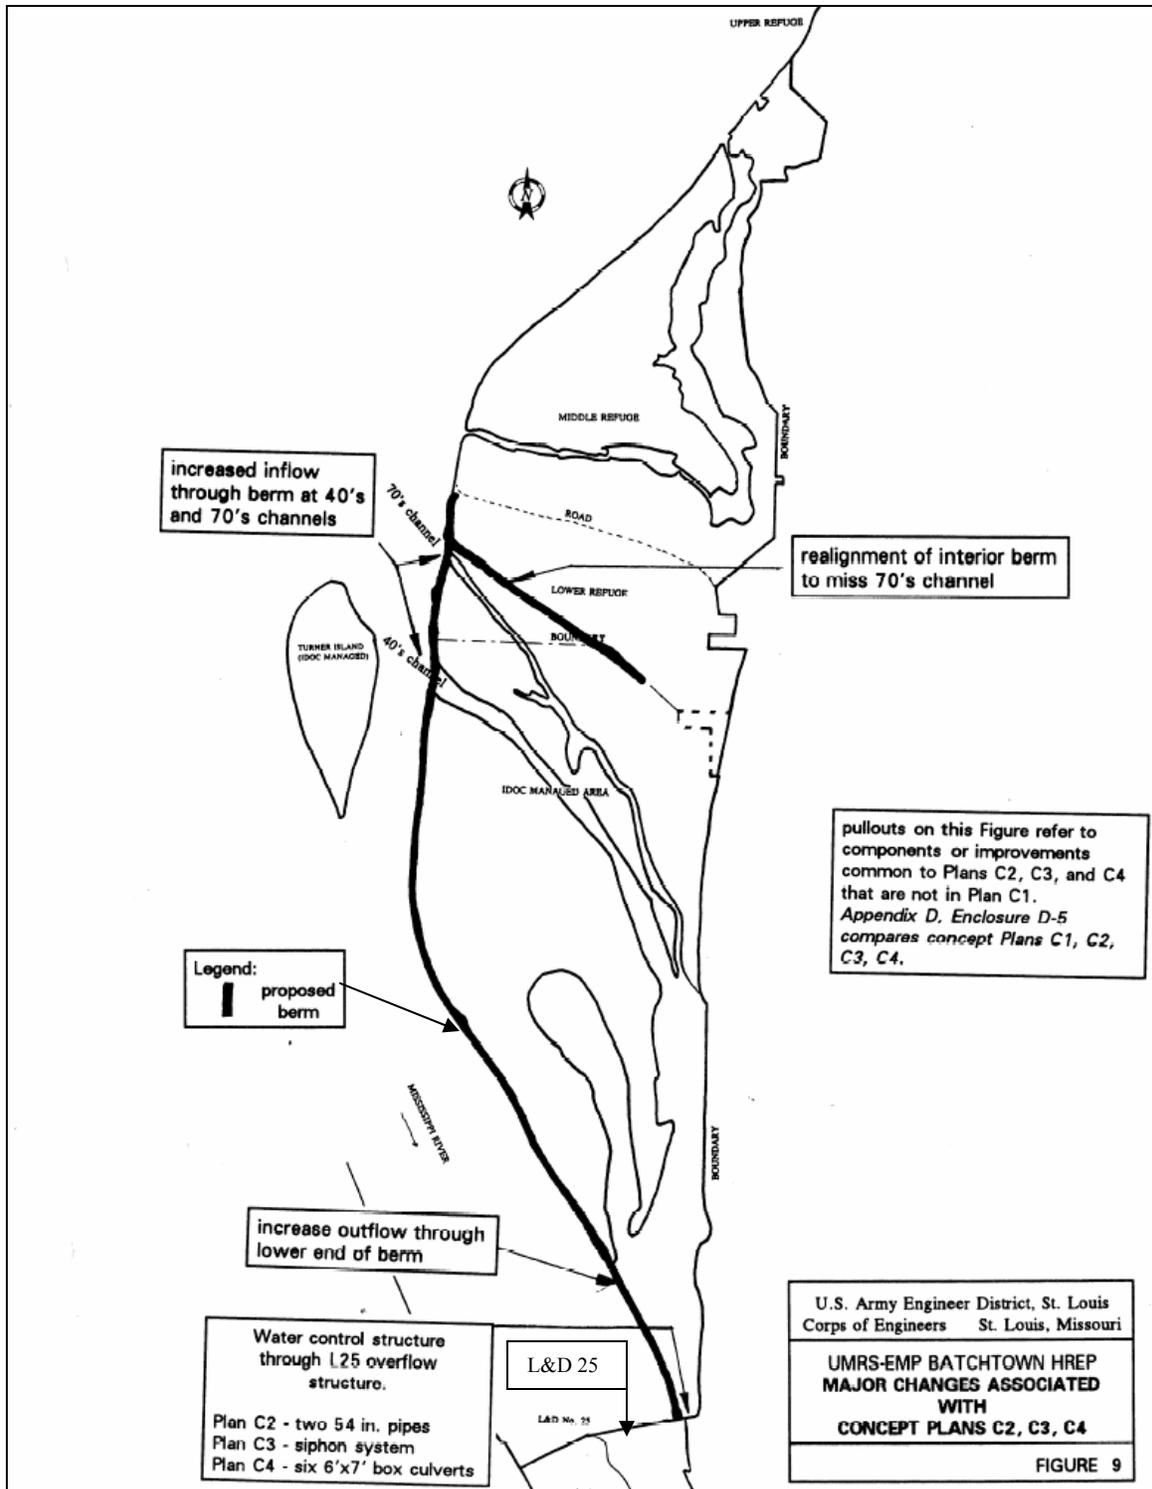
Diagram of Plan C2 (previously proposed berm extending to Lock & Dam 25).
